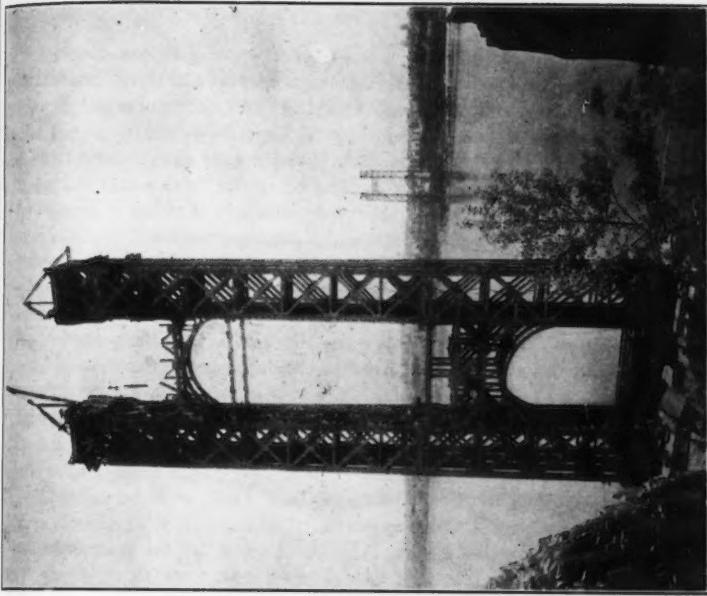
ERECTION UPPER PORTAL STEELWORK.
